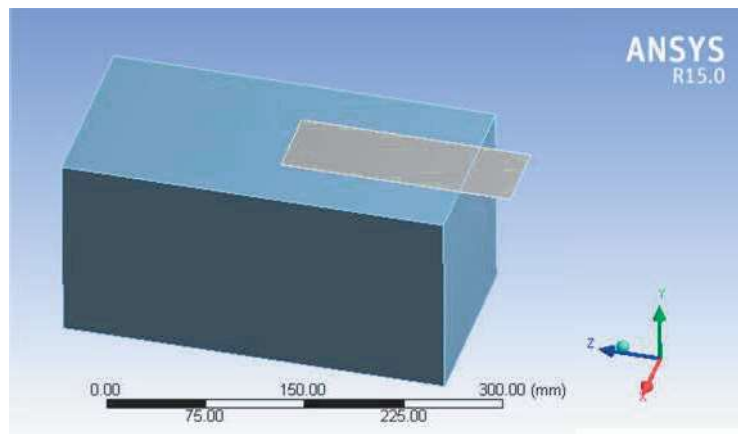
Concrete Specimen with Bonded GFRP (150 mm)
